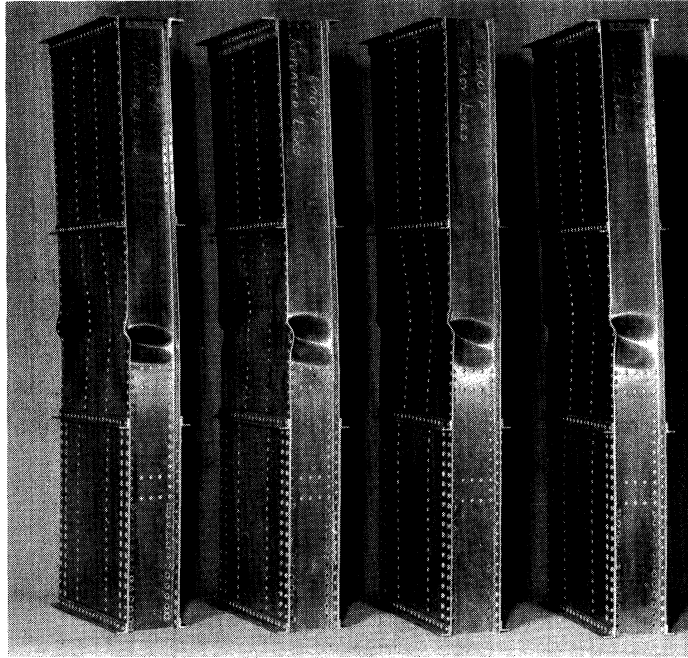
Box beams after destruction, steady-load, repeated-load, and reversed-load tests at 600°F.
